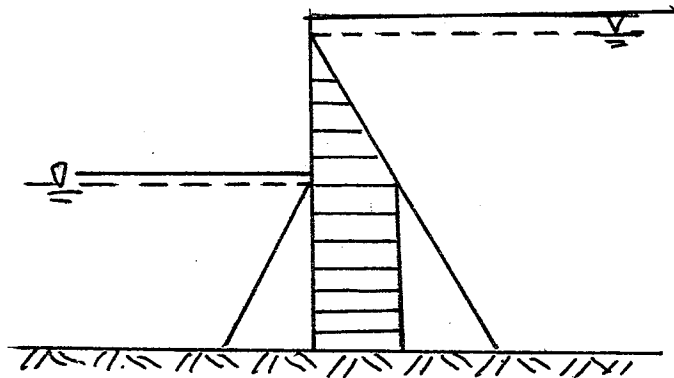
Embedded Wall taken to an Impermeable Stratum
